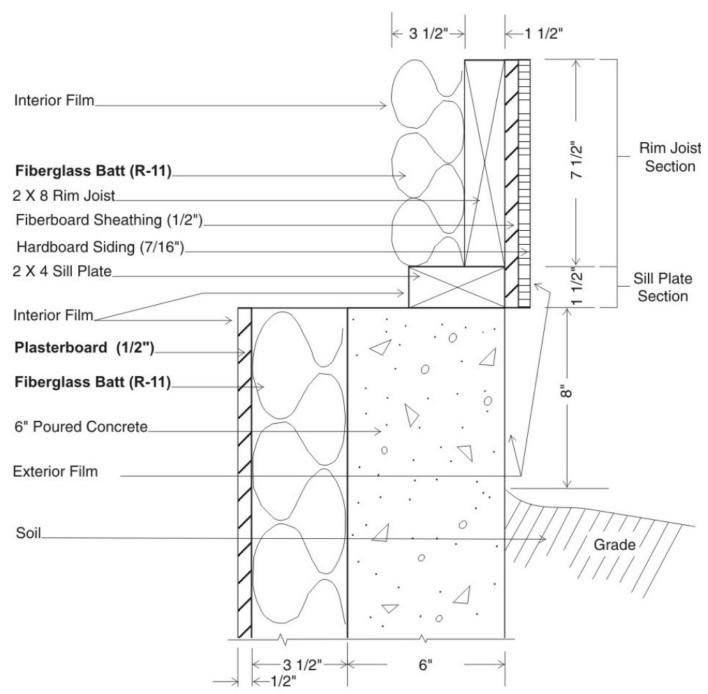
Case L324A Insulated Basement Wall and Rim Joist Section (ANSI/ASHRAE 2011, Figure 7-24
